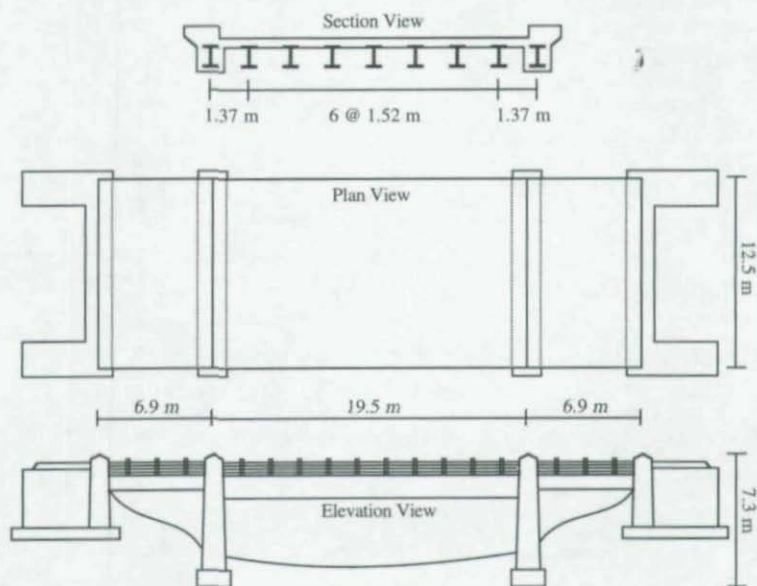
Section, Plan, and Elevation Views of Test Bridge
